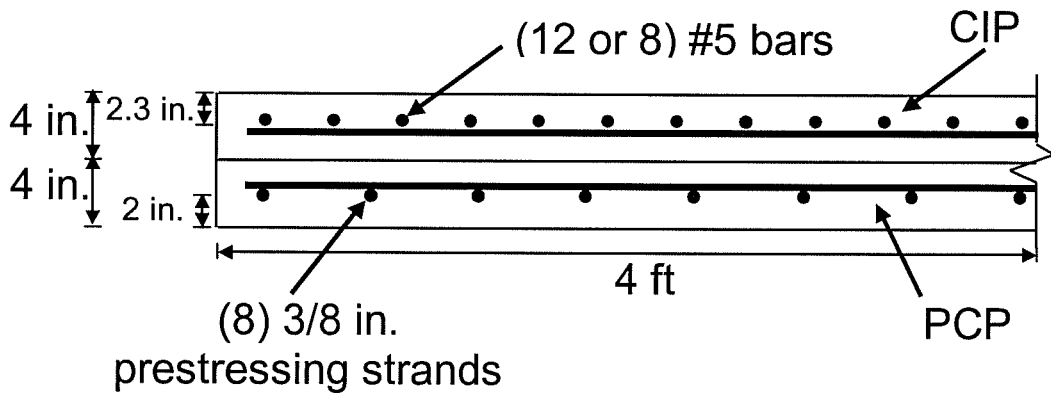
Cross-section view of Precast Concrete Panel and Cast-in-Place Concrete Topping
